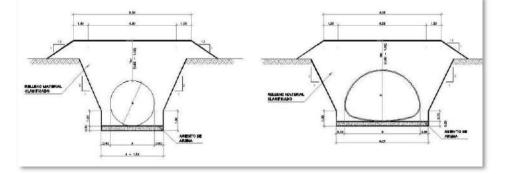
Outline of Pipes with Vaulted and Circular Section
